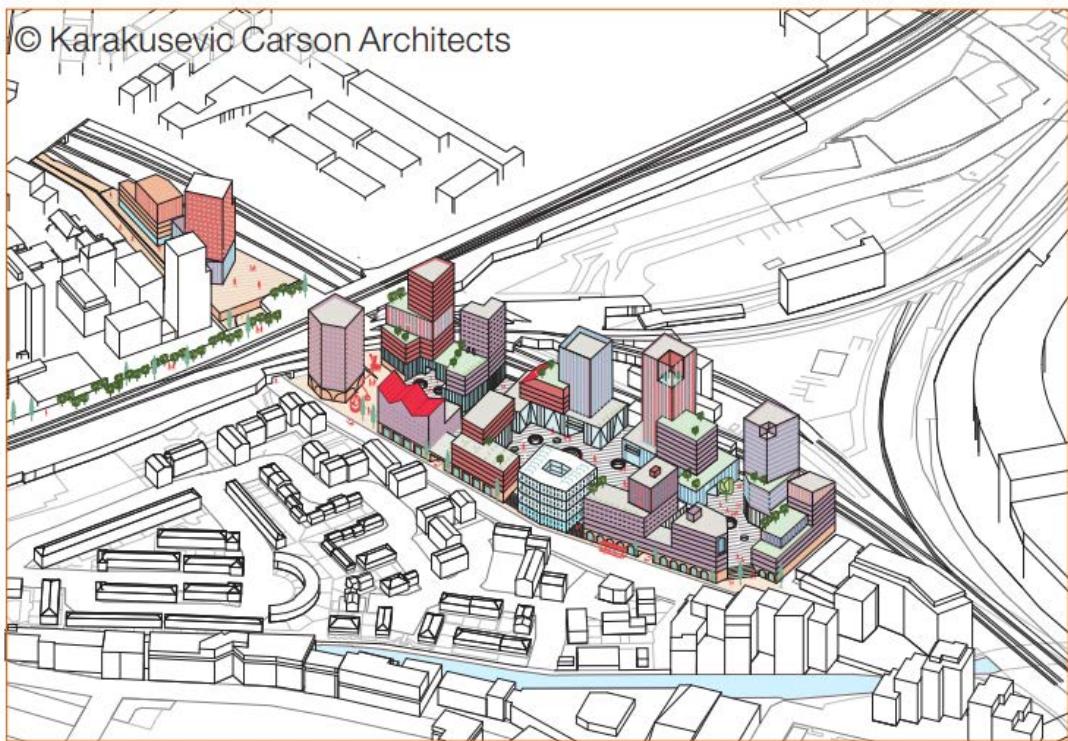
Illustrative masterplan for the area with view towards north-east as presented in the Camley Street Neighbourhood Plan (2021)
